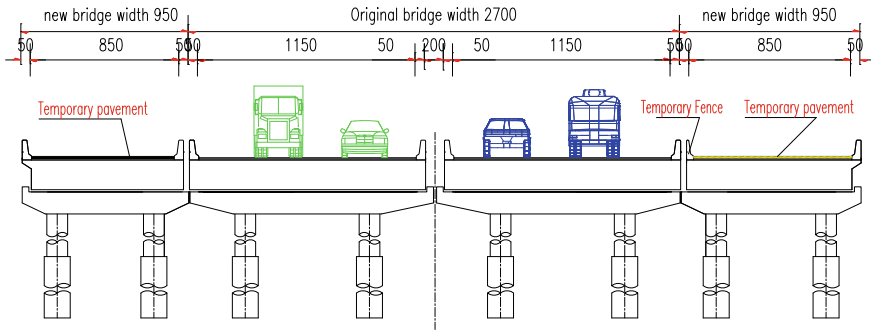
Example of road surface construction traffic organization (unit: cm)
